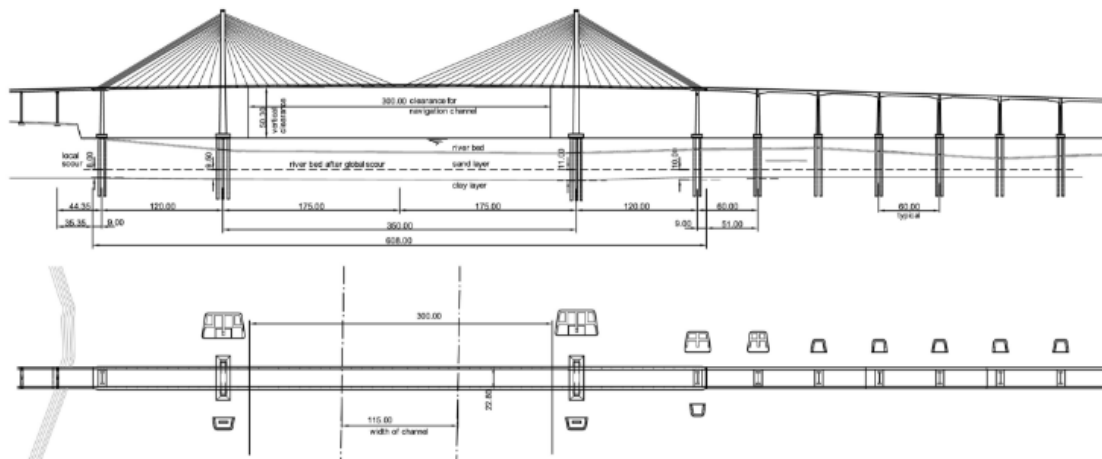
Rosario Victoria bridge view and plan of the main bridge and protective structures
